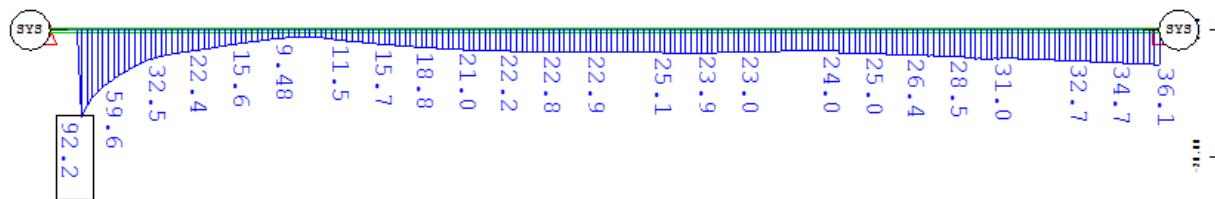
Stirrup reinforcement after 3rd optimization step, cantilever phase, concrete variant
